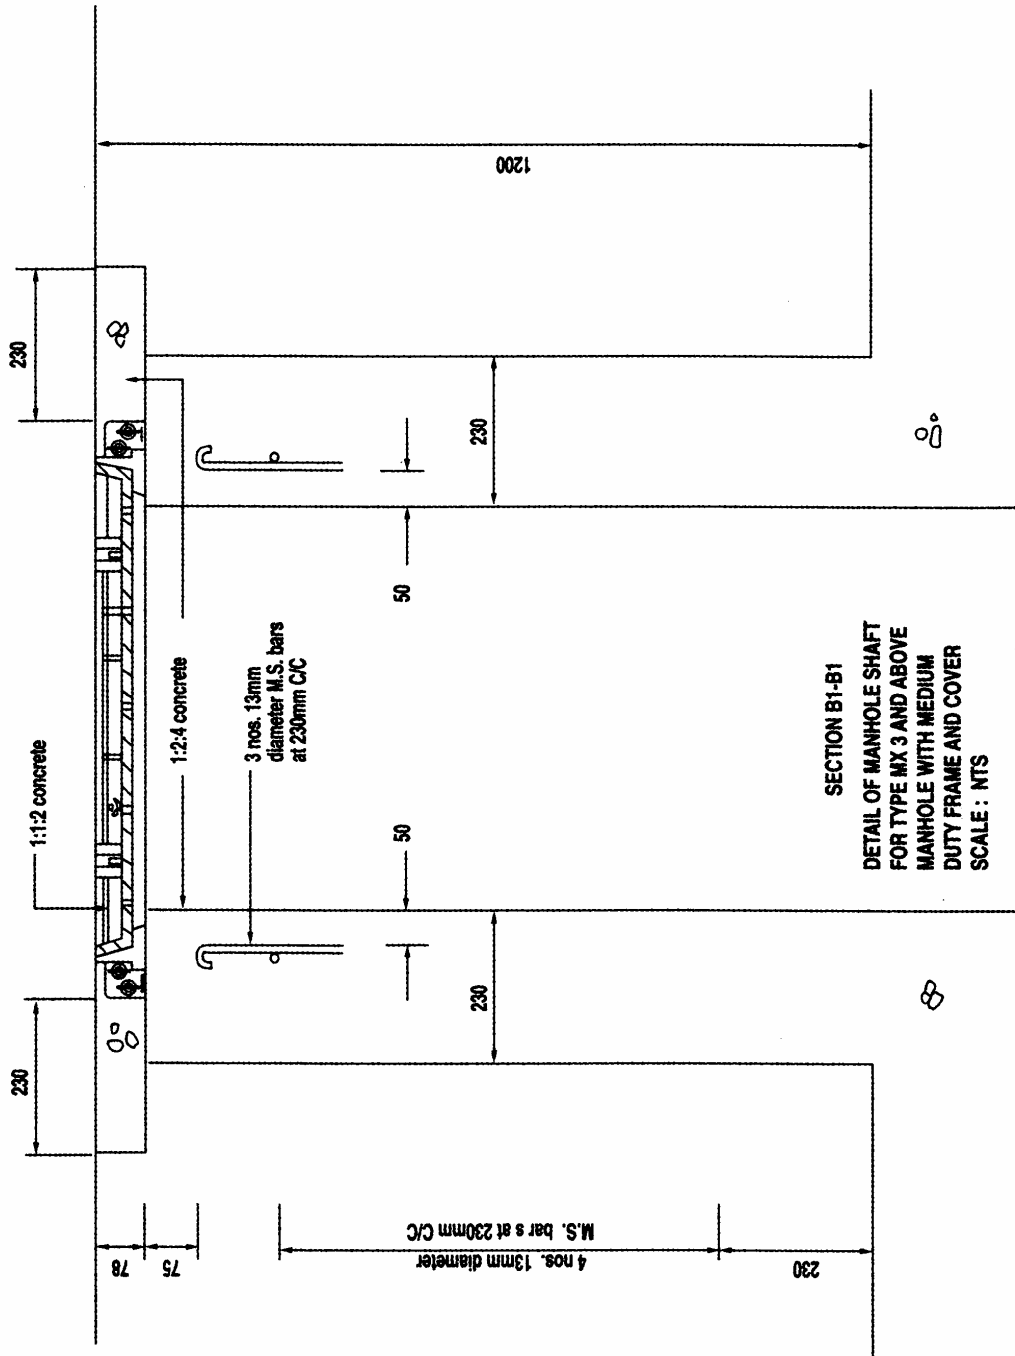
MANHOLE DRAWINGS - TYPE MX3 & ABOVE
